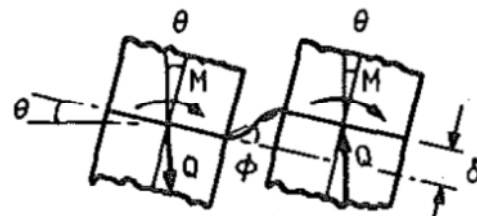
Deflected shape of the connecting slab in shear wall structure.
